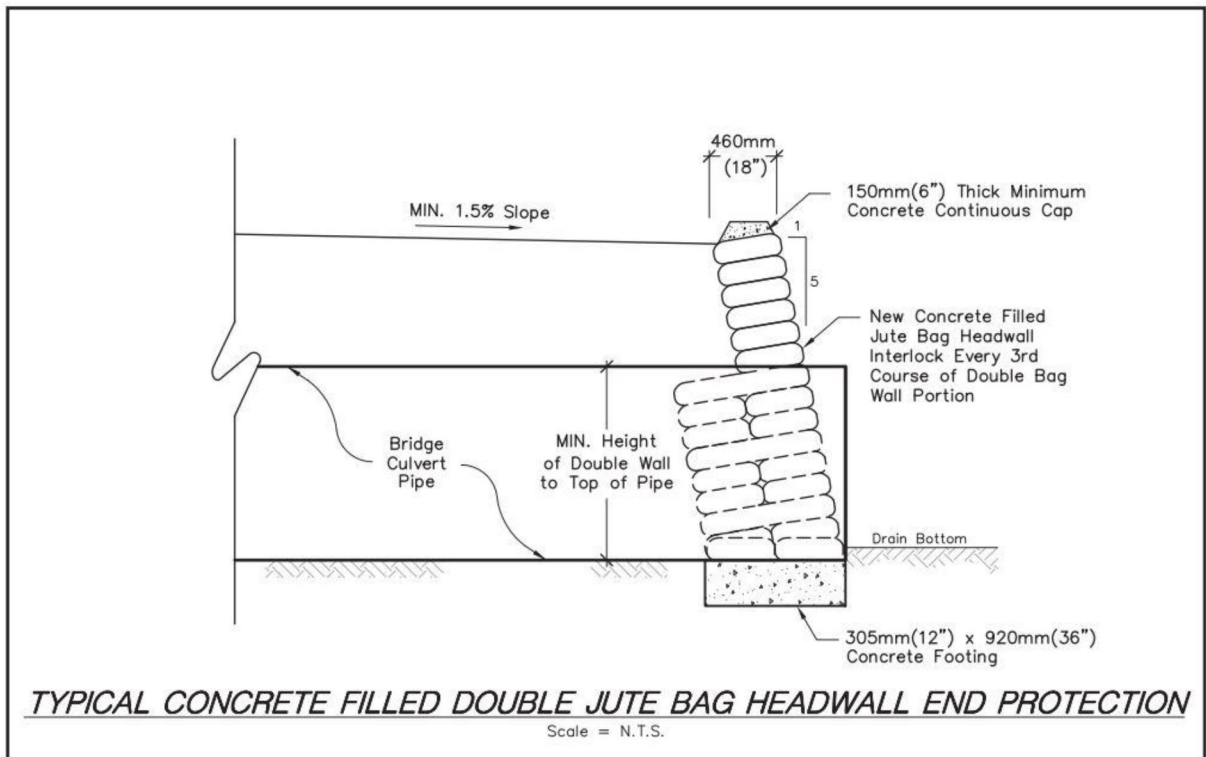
Typical Concrete Filled Double Jute Bag Headwall End Protection Detail
